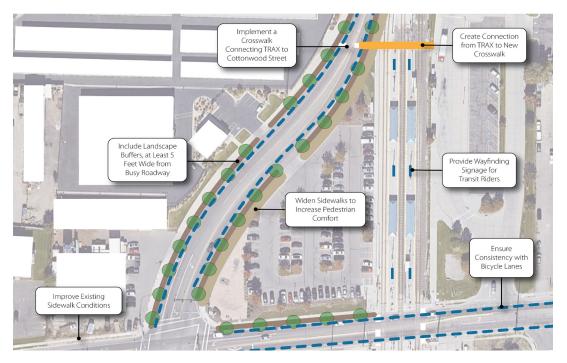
Location where sidewalk and crosswalk are needed on Cottonwood Street with access to the TRAX station.
